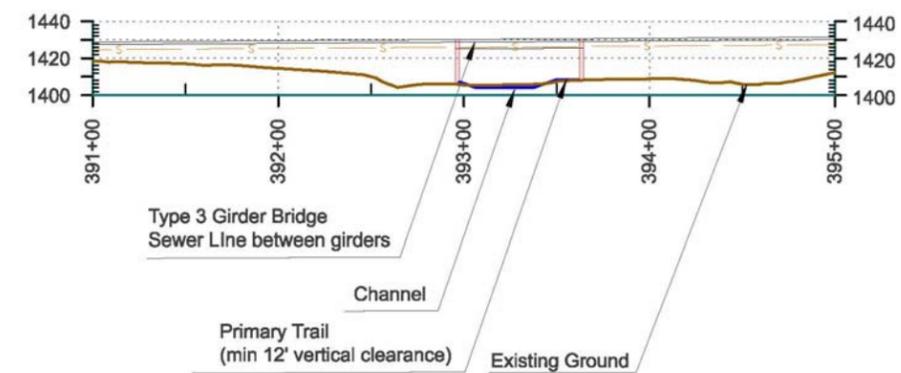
Alternative 4: Bridge Over the Unnamed Wash (Profile View)
